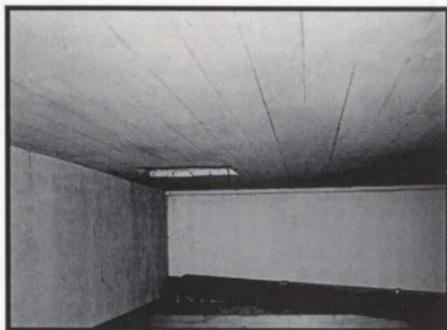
Crawlspace between the first and second floors over the Lower Hall reveals the original ceiling and wall finishes for this room.
